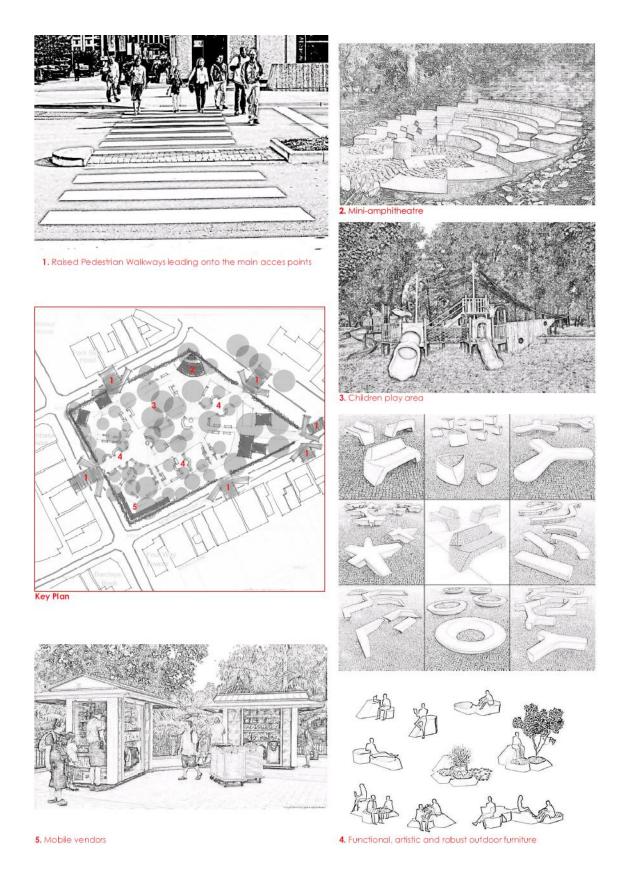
Proposed Design Interventions on Jeevanjee Gardens
